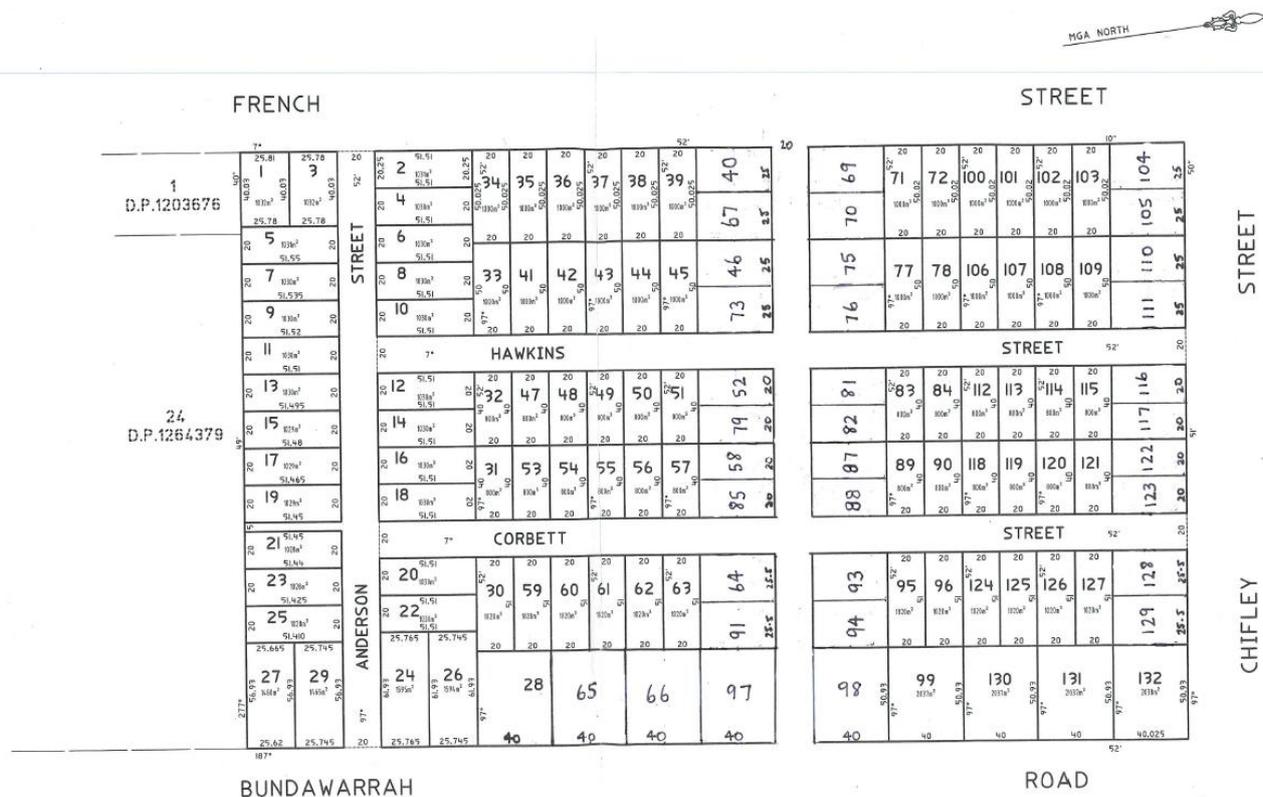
Version 2 - Revised subdivision layout proposed in submission
